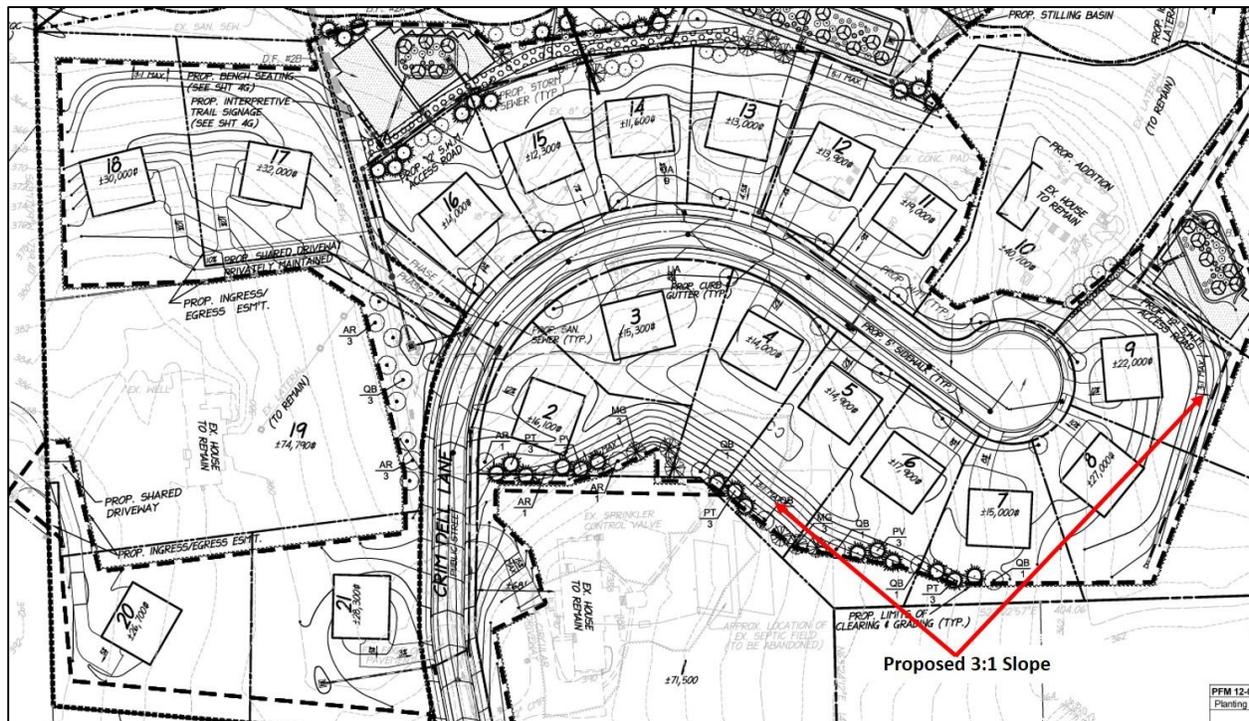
Source: Preliminary grading provided by applicant and added annotation
